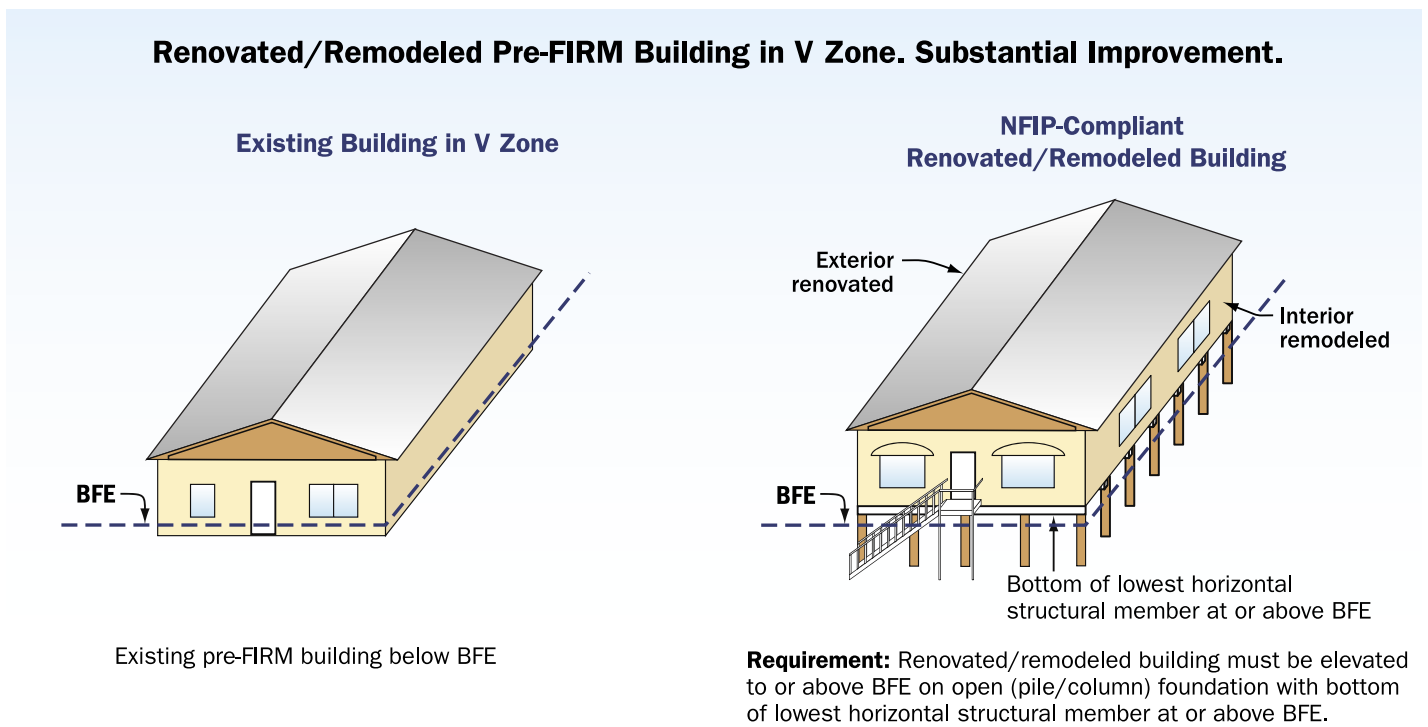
Substantial improvement: Renovated/remodeled building in a V zone.
